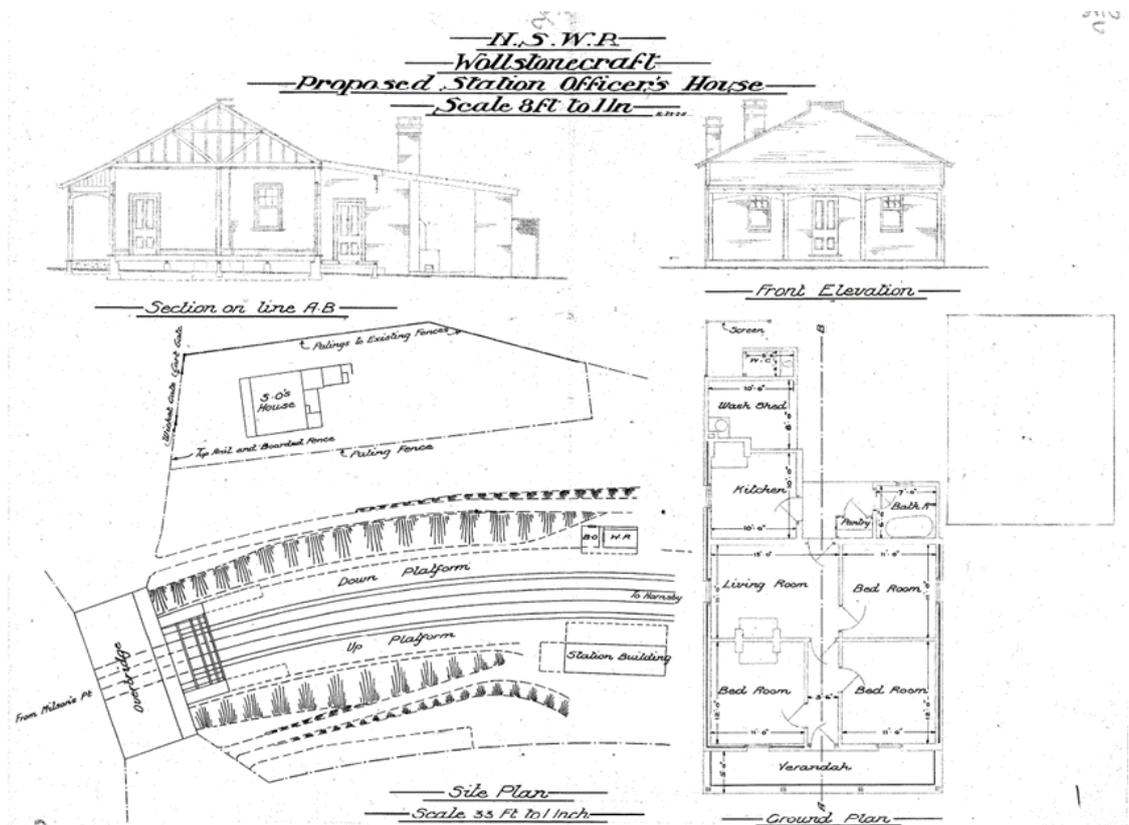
Plan of Station Officers House, c1911. (Source: Australian Rail History Society)
